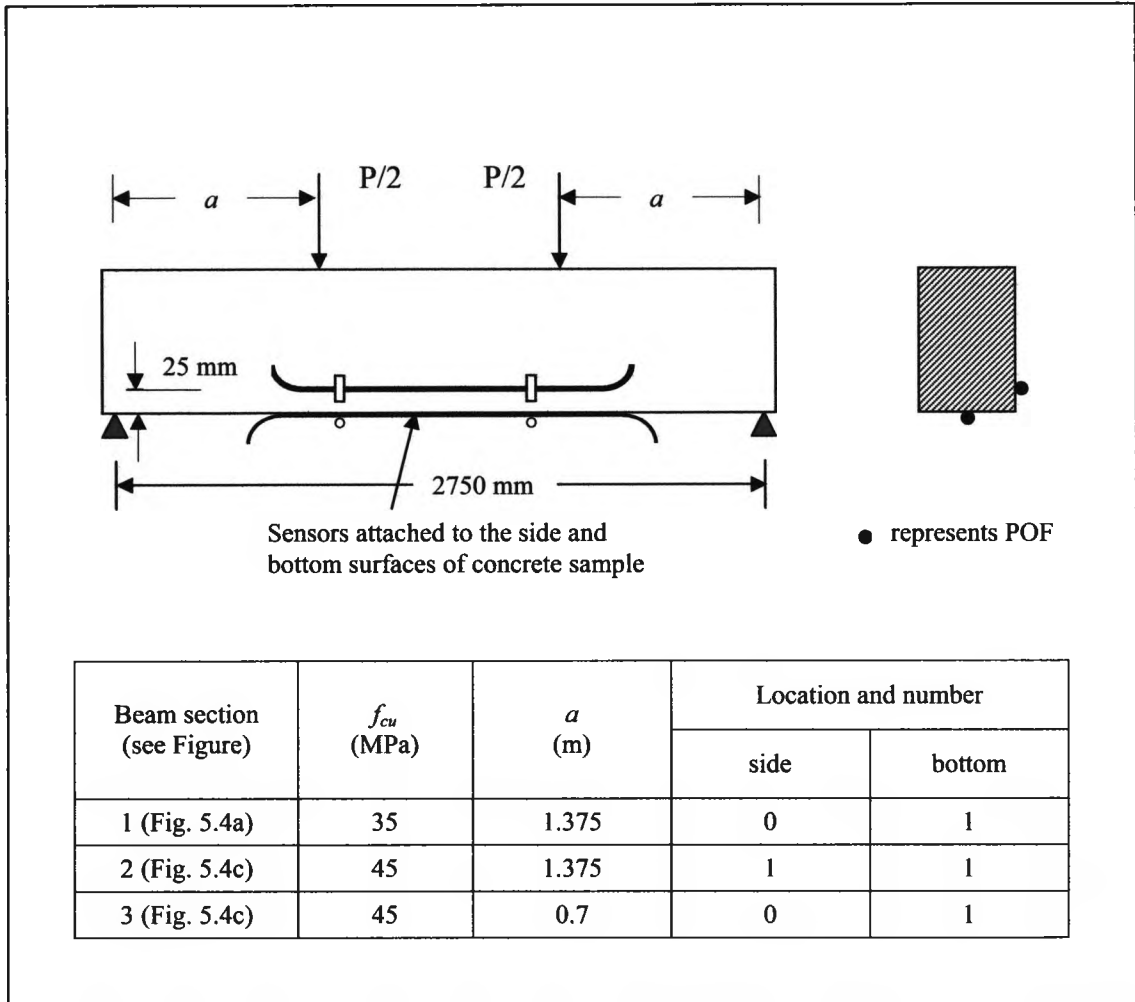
Detail of POF attached on the surface of reinforced concrete specimen
